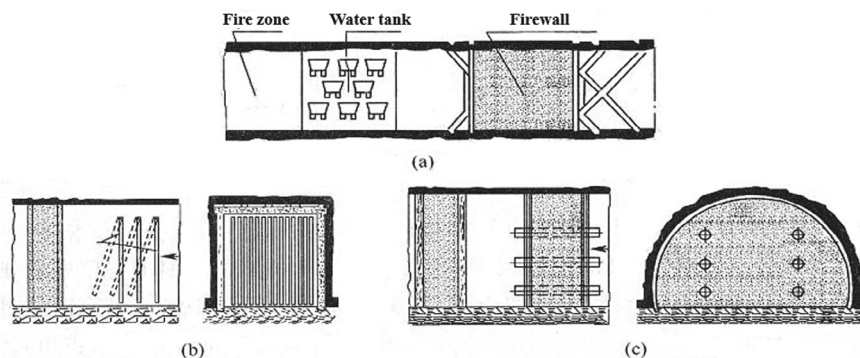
Explosion-resistant seal wall with buffering facility. a Blast-resistant seal wall with sink installation; b blast-resistant seal wall with wave-absorbing steel curtain; c blast-resistant gypsum double wall confinement with wave elimination holes
